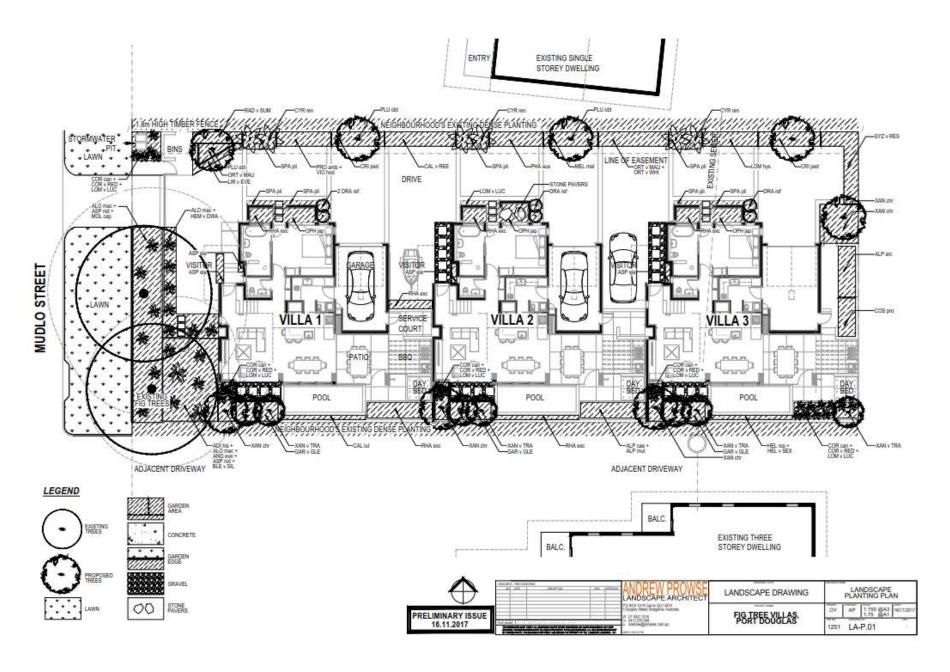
FIG TREE VILLAS, 14 MUDLO STREET, PORT DOUGLAS DRAWING NO.: LA-M.01
